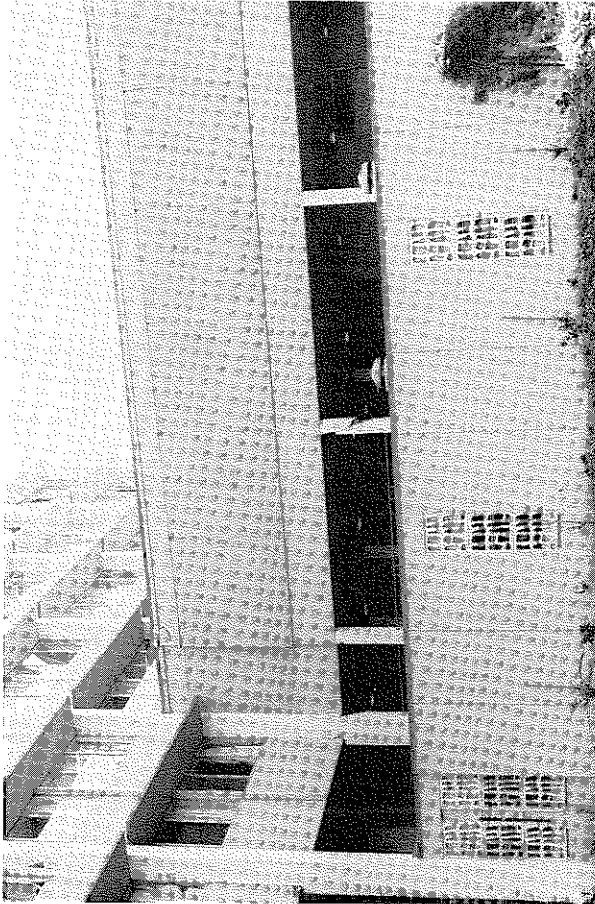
Three-story corridor annex to the Holy Cross Hospital. Column damage is present in both the annex and the hospital building.
